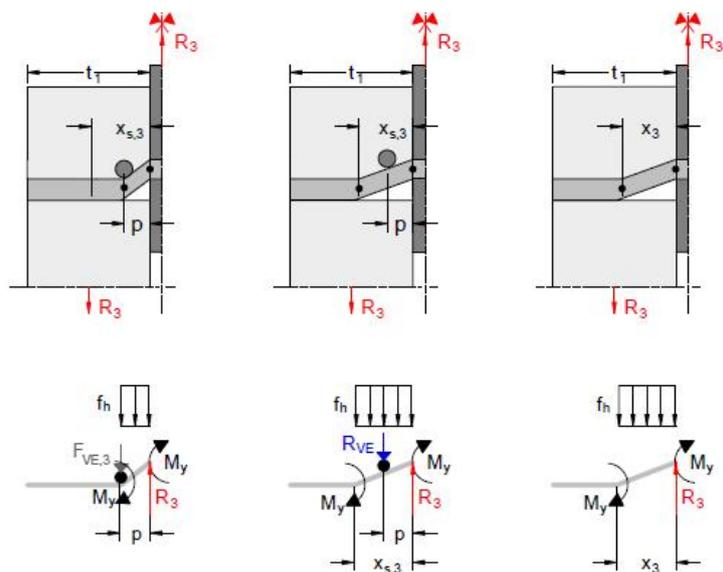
Reinforced connection with sub-failure mode “rigid”, reinforced connection with sub-failure mode “soft” and non-reinforced connection
